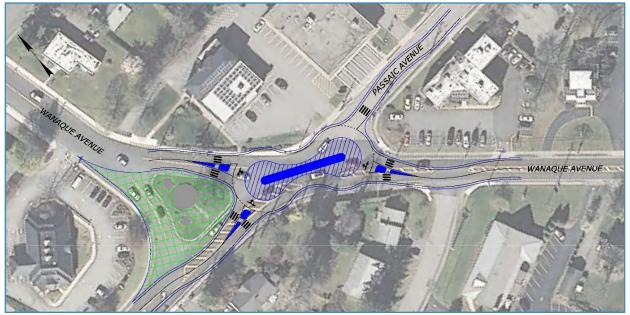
Proposed Roundabout at Wanaque Avenue and Passaic Avenue
